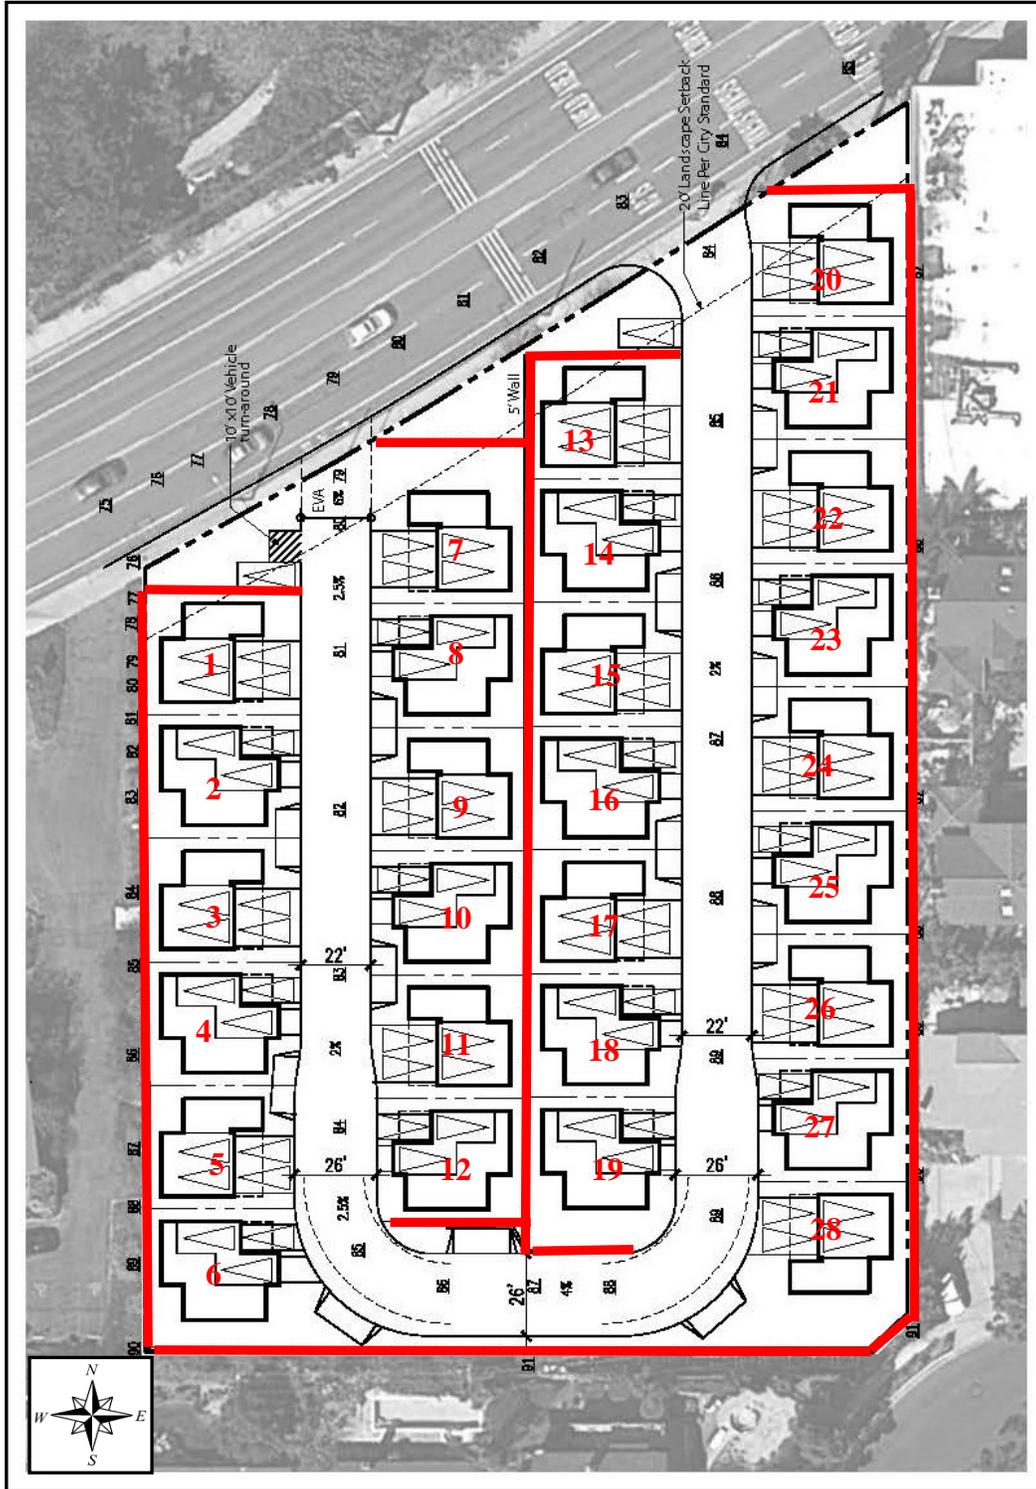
Location of the Planned 6 foot Perimeter Walls (Red Lines)
